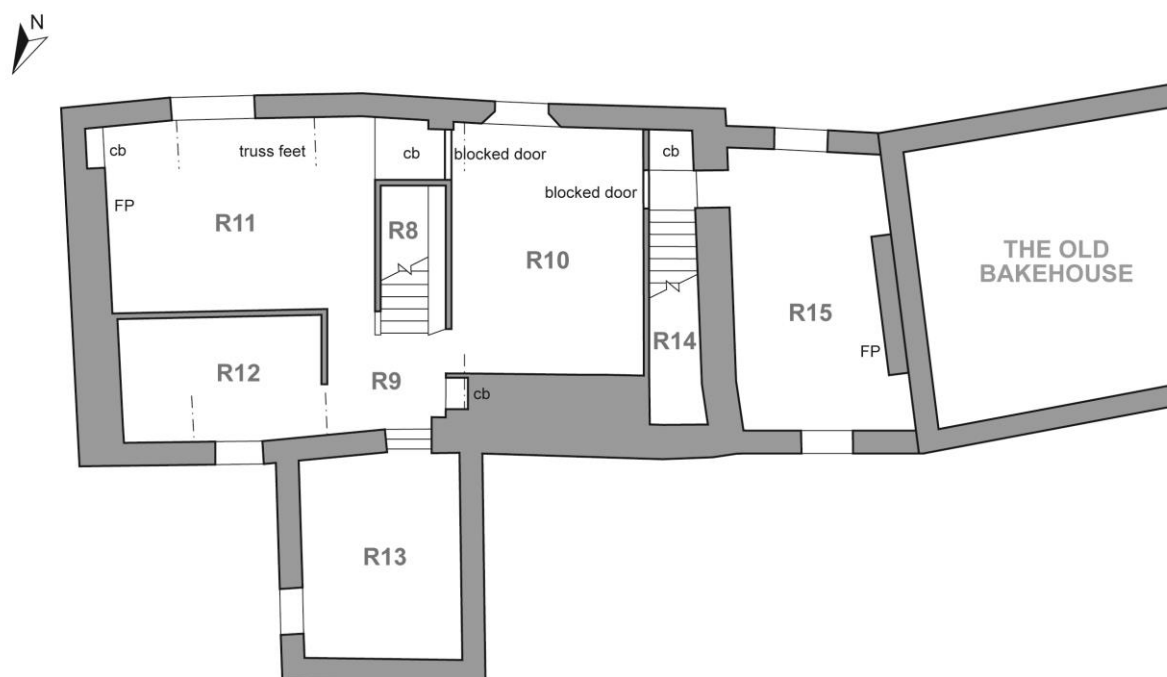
FIRST-FLOOR PLAN OF THE COTTAGE.
